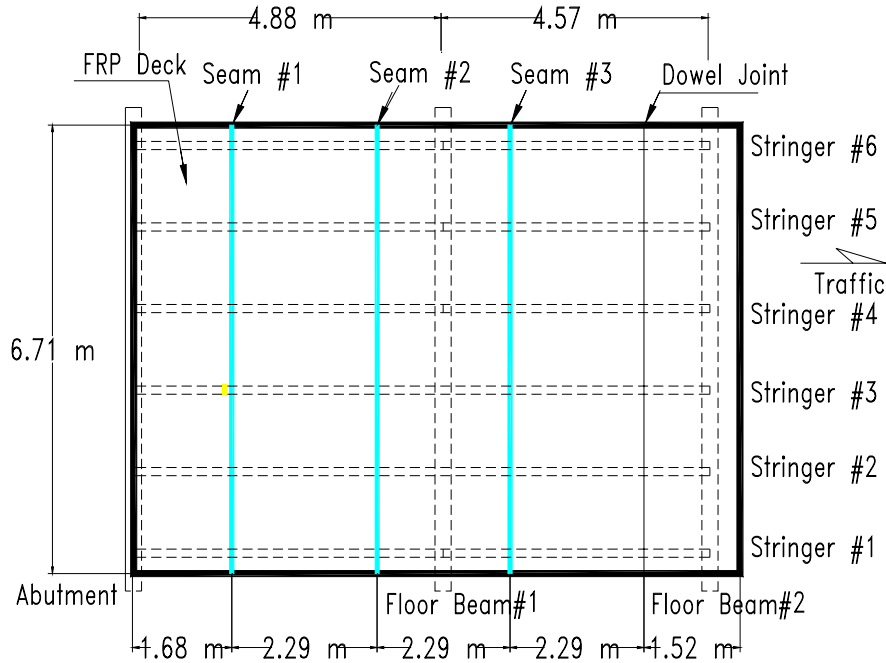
FRP deck panels and joints of the Hawthorne St. Bridge mock-up
